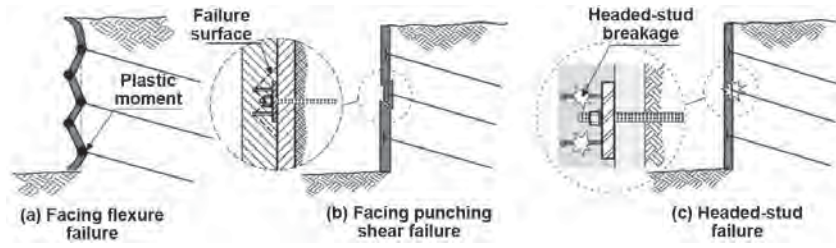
Facing failure modes of soil nailed walls (Lazarte et al., 2003).
